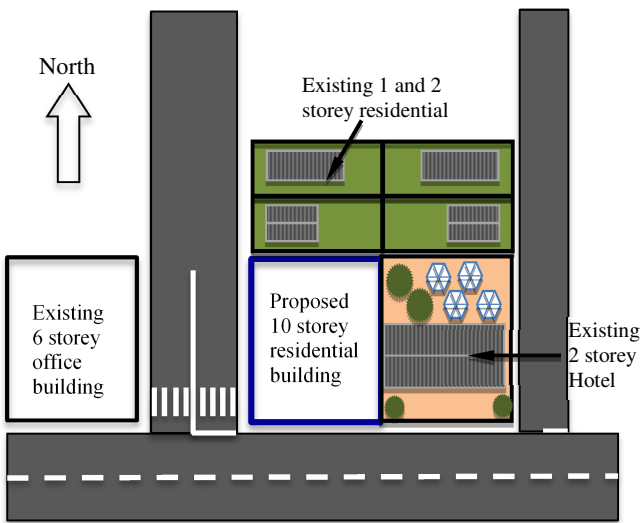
A ground level plan of a hypothetical proposed development and adjacent existing developments.
